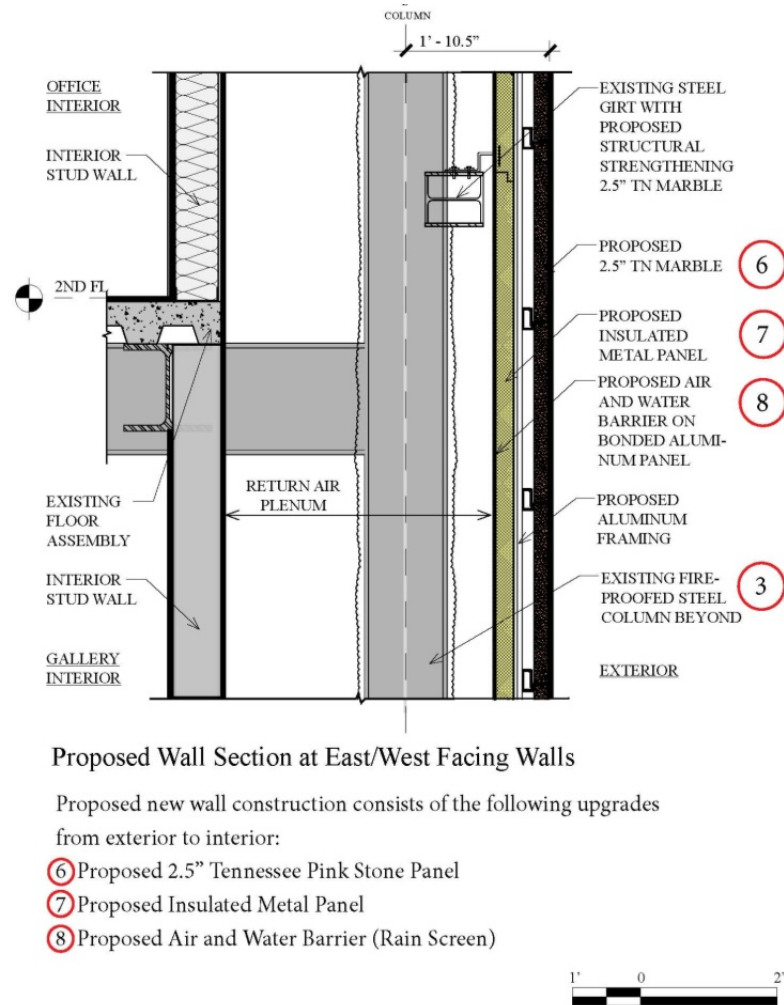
8: Proposed Exterior Wall. (Source: QEA.)
